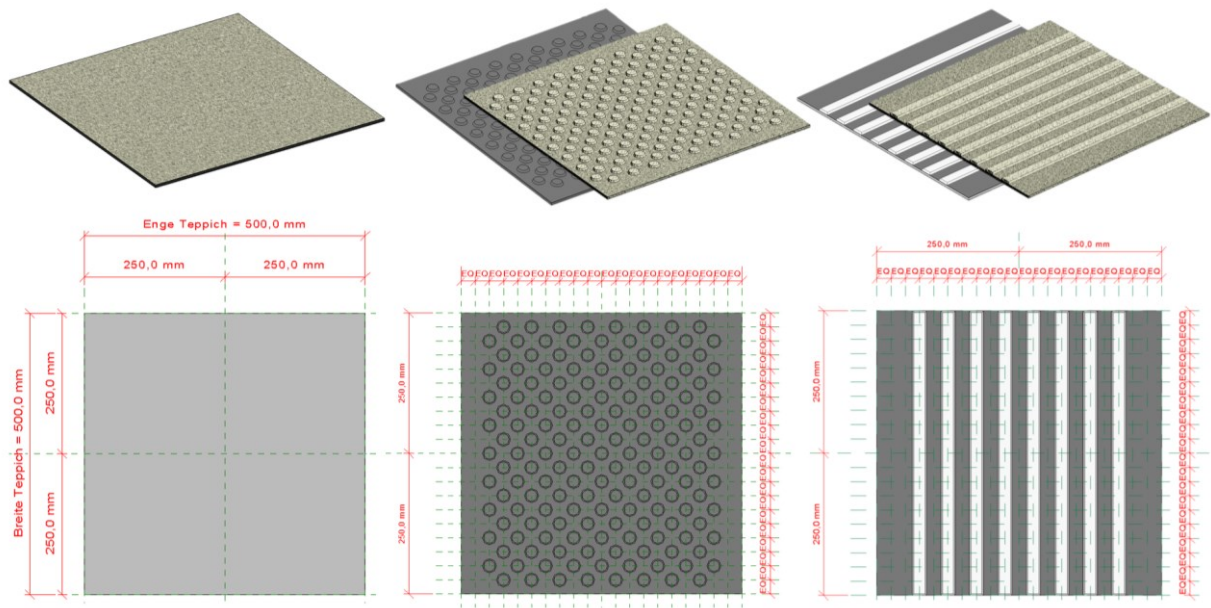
Modelling of a loadable BIM object for textile flooring with knobs and stripes (Source: A. Juraboev)
